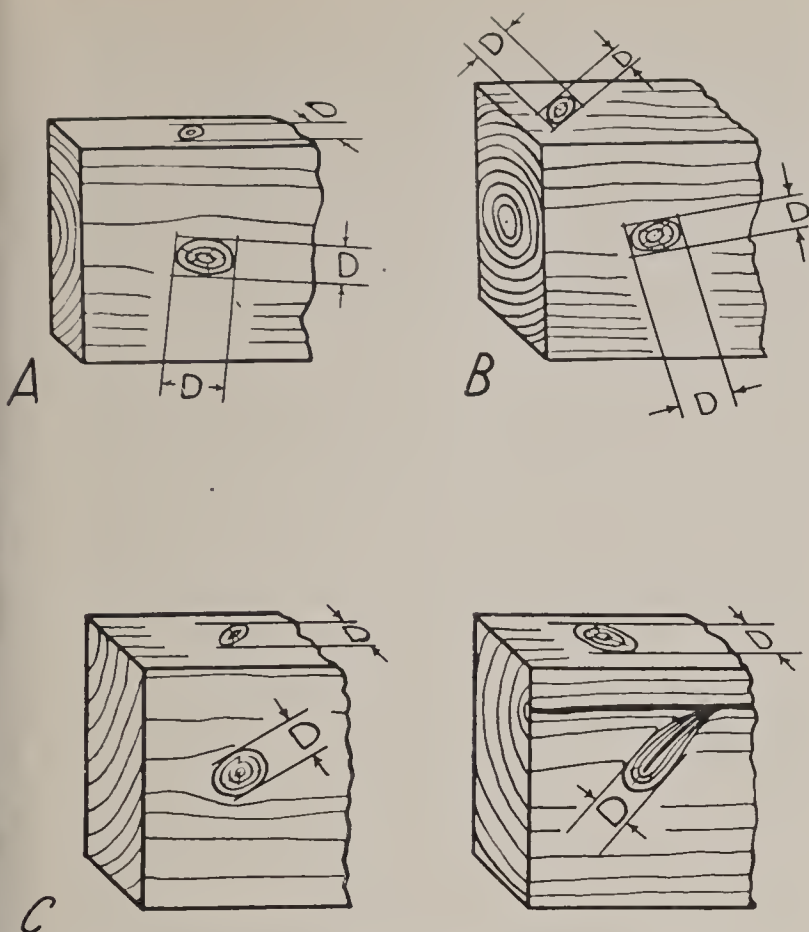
Measurement of knots: A, in joist and plank; B, in posts and timbers; C, in beams and stringers.
